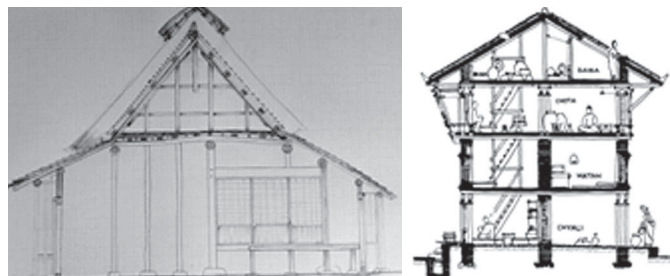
Section of Tanaka Building (Left), and Newari Building (Right)
